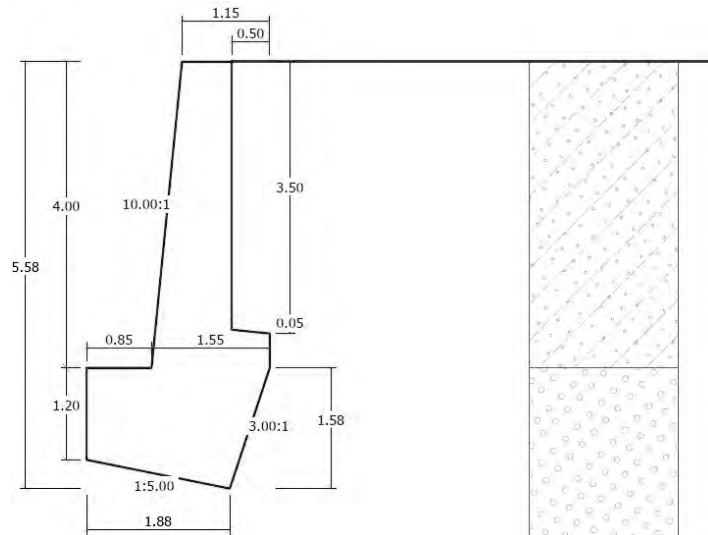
Geometrical characteristics of masonry gravity retaining wall
